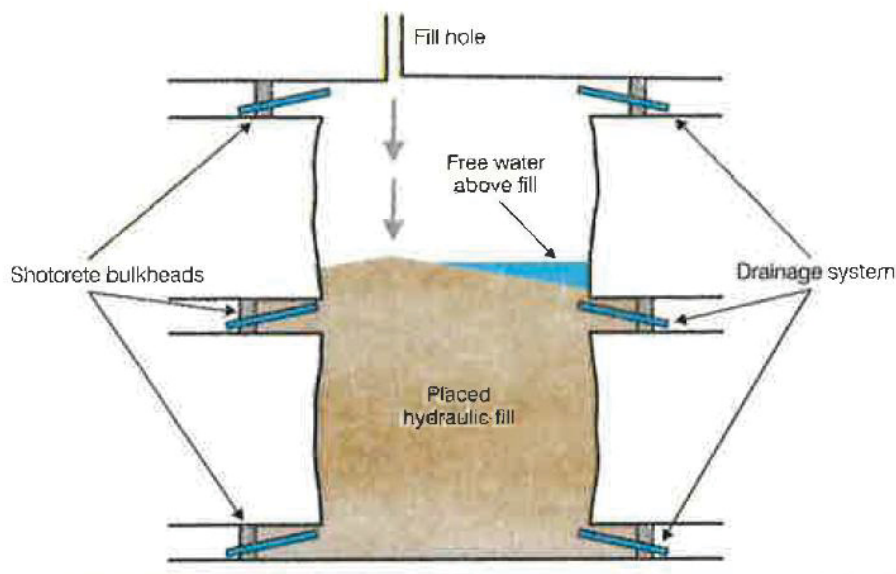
Scheme of hydraulic fill placement⁶ p.24
